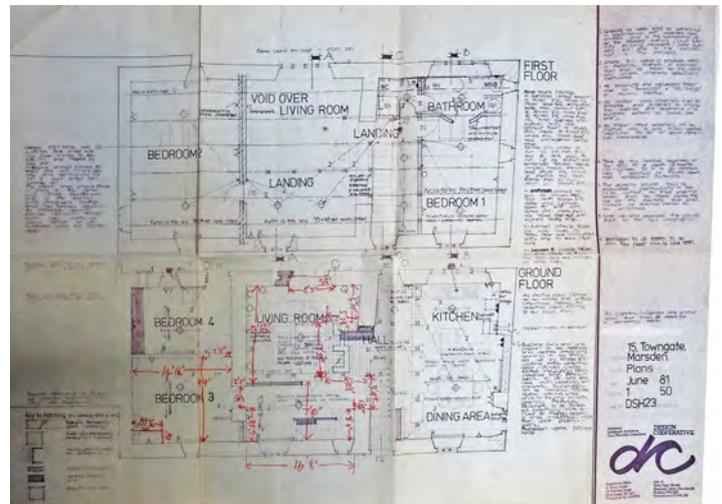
proposed plan by Design Cooperative Architects of Manchester, dated June 1981
